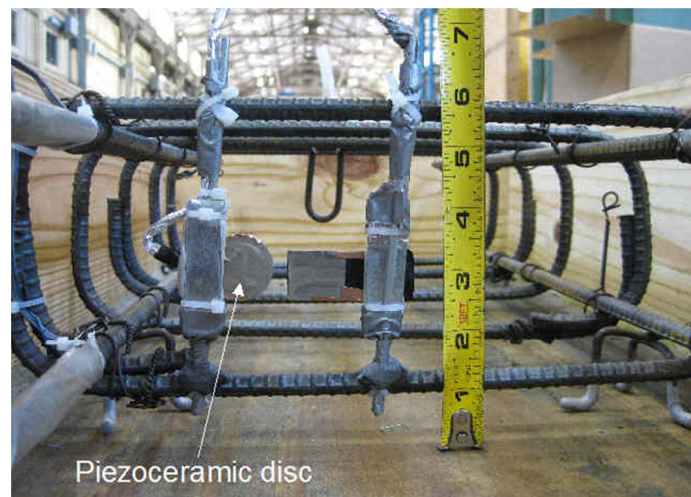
Installation of embedded piezo sensors to reinforcing bars in a concrete specimen.
